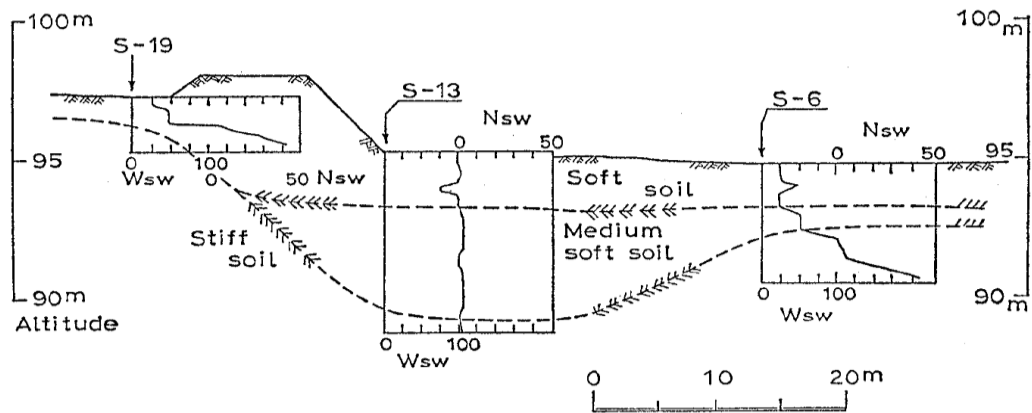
Soil stratigraphy and pre-failure cross-section of the Metoki Road Embankment (Ishihara et al., 1990)
